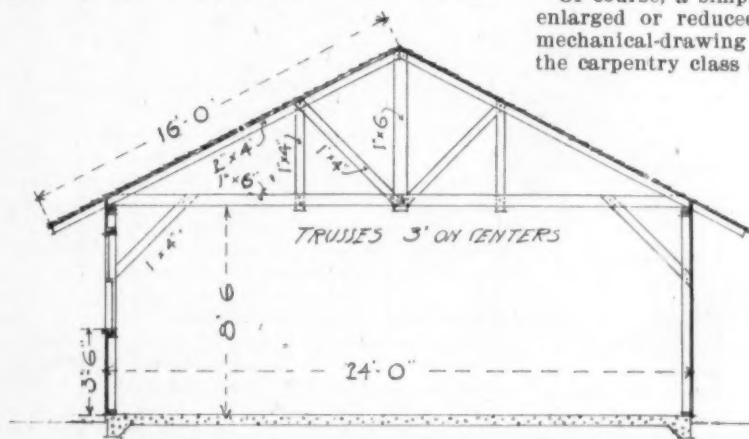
(Above) Cross Section thru any part of Building; either center or wings; scale 18-inch to 1 foot.
